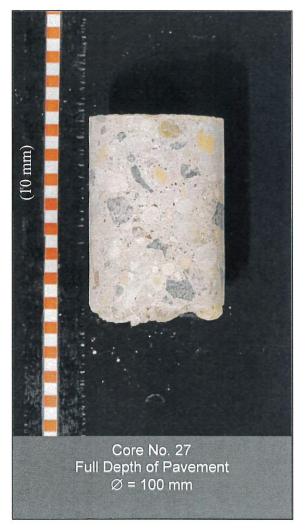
Specimen from Stillwater Road, Northbound Lane
